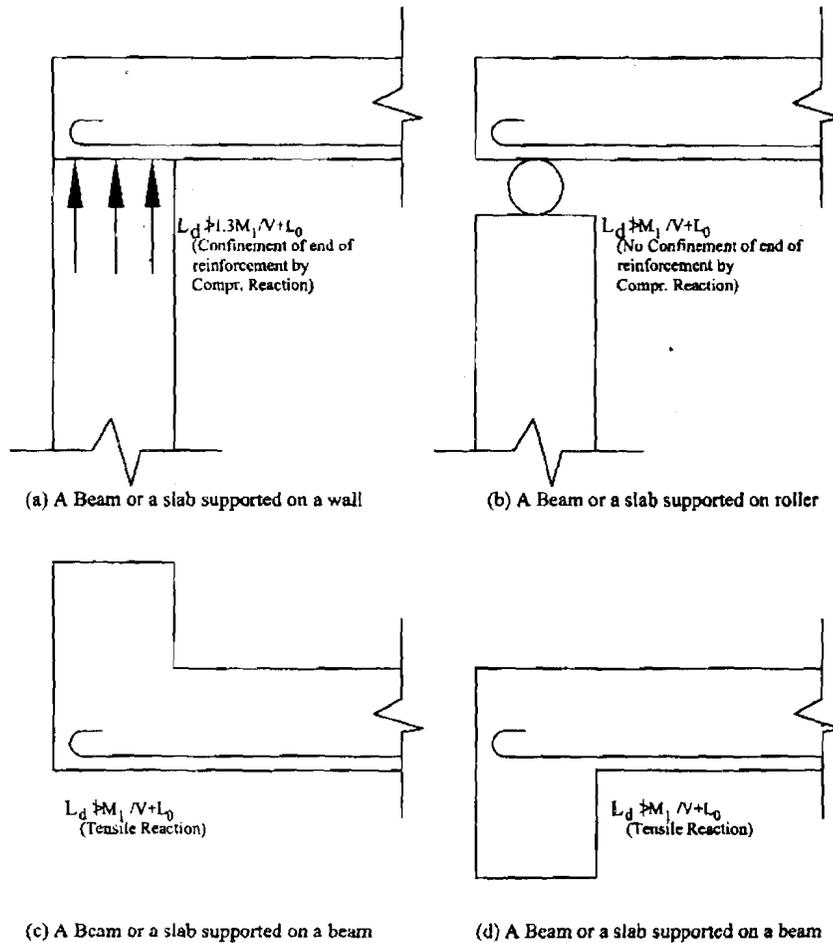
Different Support Conditions for a Beam of a Slab
